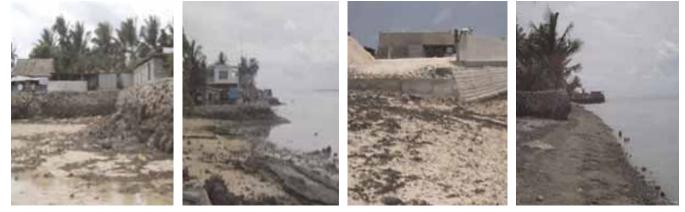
Nanikai Stone wall. Figure 82 Tarawa sea wall. Figure 83 Mormon Church seawall. Figure 84 Reclaim seawall extend to lagoon. (Source: Fig.77-84: Woodroffe and Biribo, 2011)
